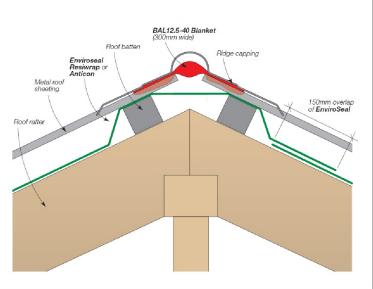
Hip/Ridge Detail - Steel Roof (BAL-12.5 - BAL-40)
